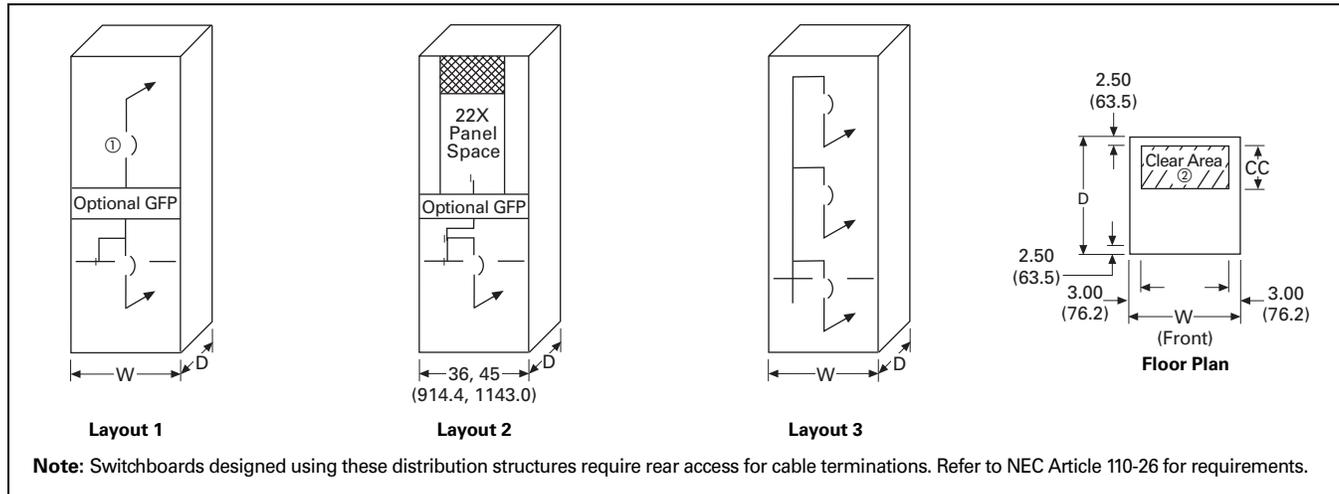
Individually Mounted Feeder Layouts—Dimensions in Inches (mm)
